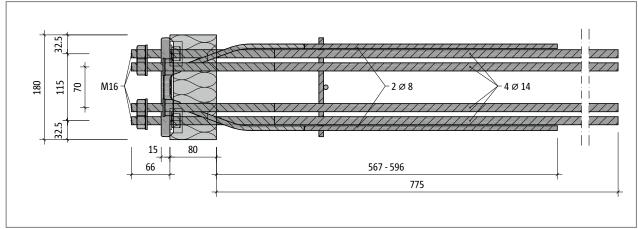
Schöck Isokorb® T type SK-MM1-VV1: Plan view
